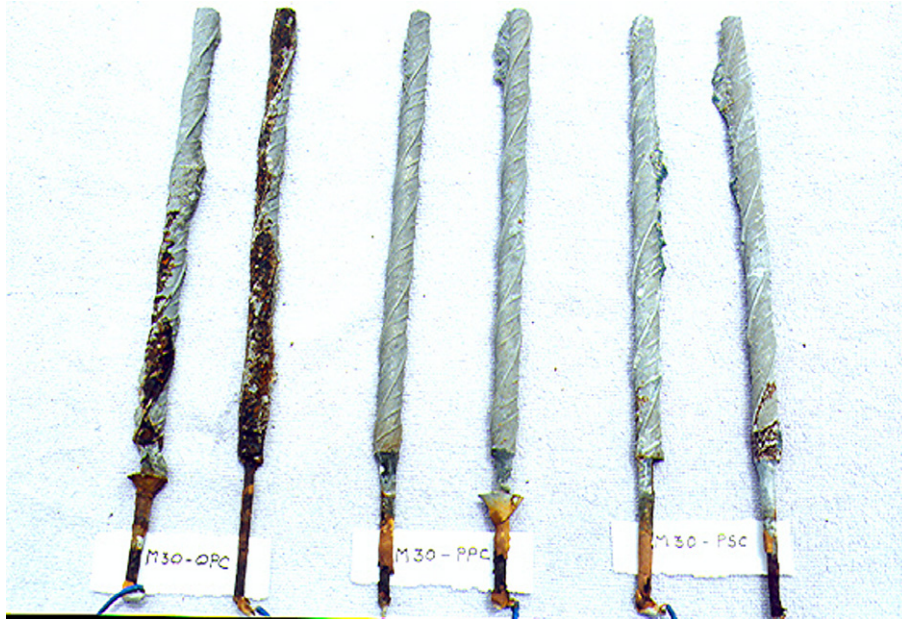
Extent of rust on rebars embedded in 30 MPa concrete.
